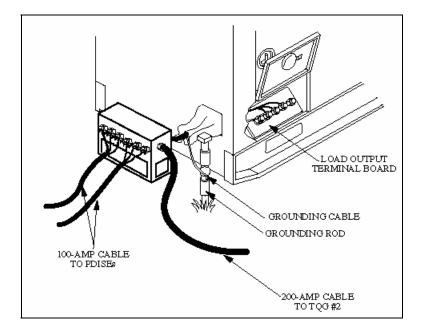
Switch box positioned at generator 1 or 3, with pigtails attached to load output terminal board
